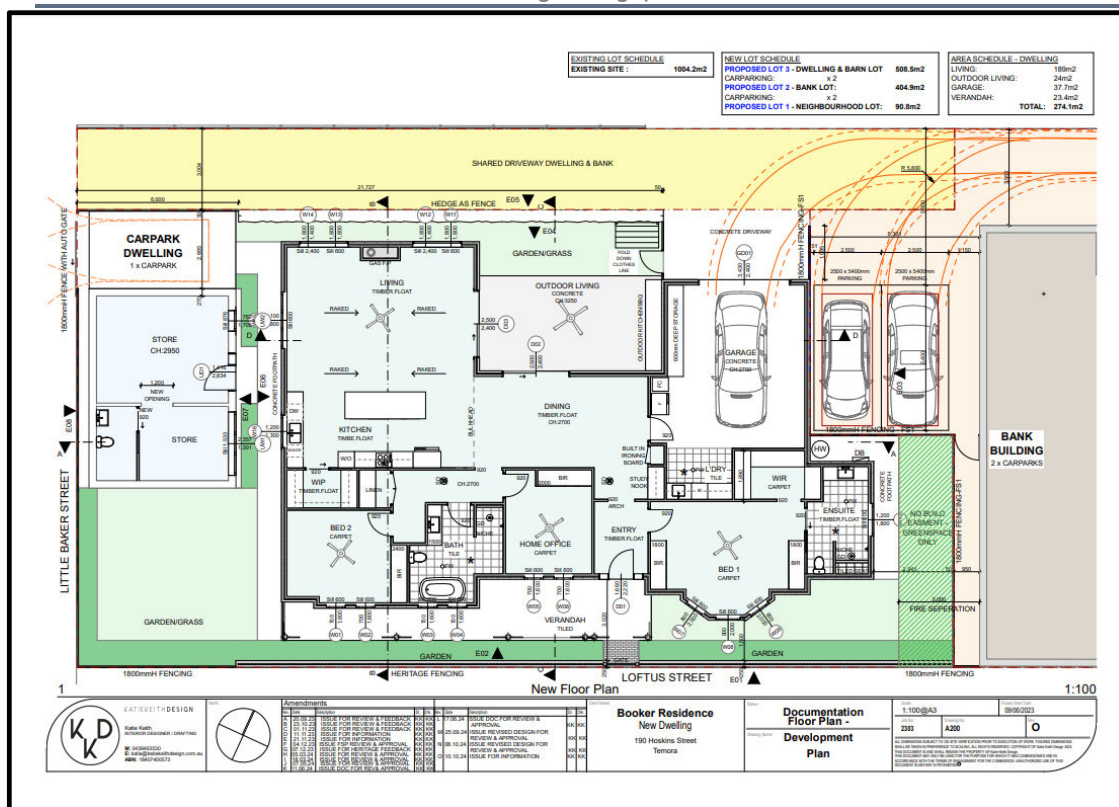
Proposed Site Plan (Source: Katie Keith Designs)
